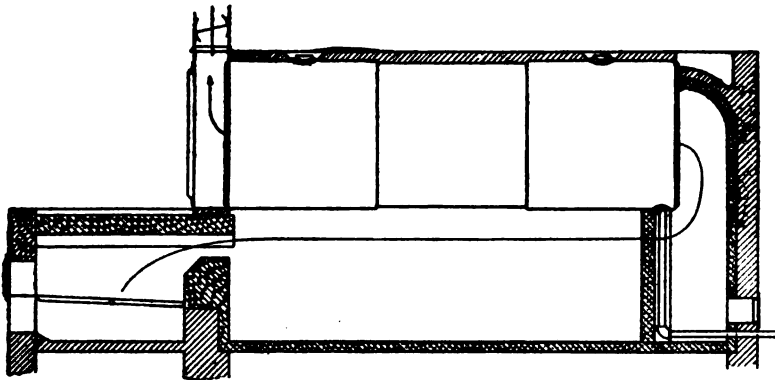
Dutch oven setting as applied to horizontal return tubular boiler.
